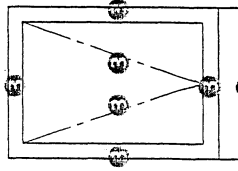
DETAIL OF MARK ALLOCATION FOR A WINDOW (2 1/2 x 4 windows = 10)
